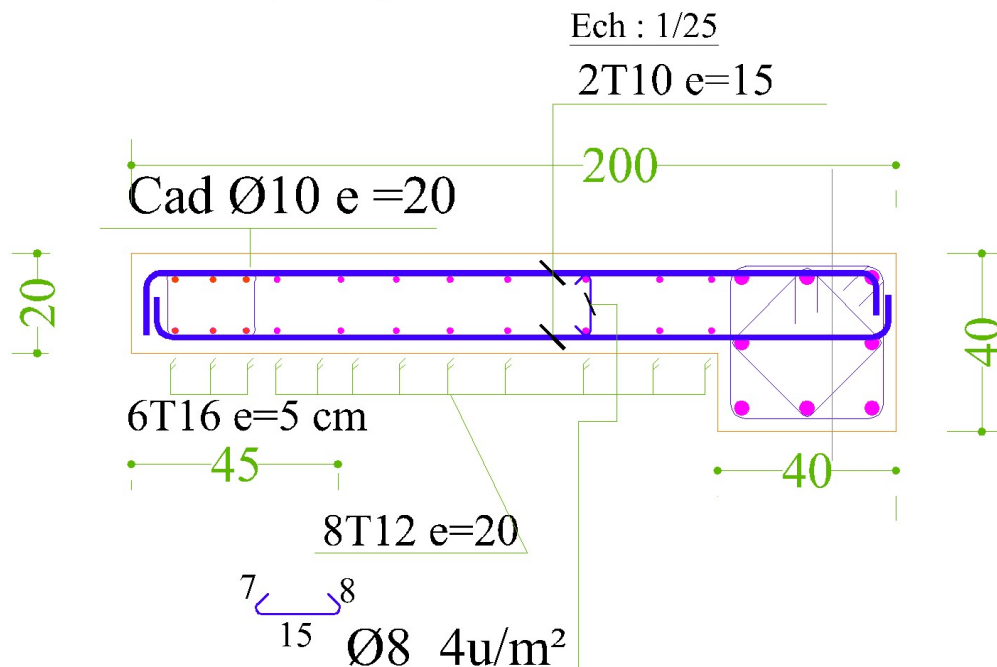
Reinforcement layout for walls (created using AutoCAD software)
